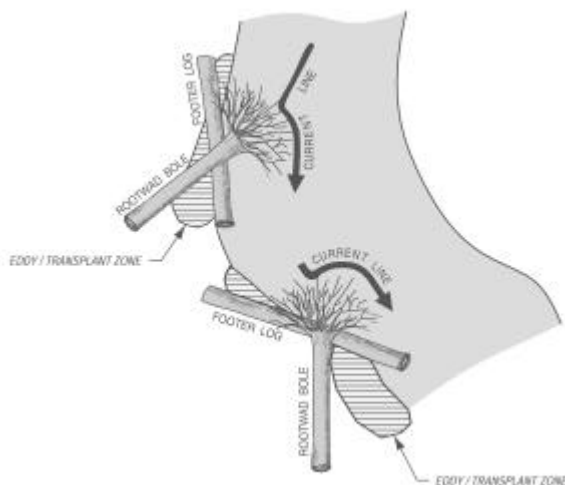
Rootwad Plan View (from Sylte and Fischenich, 2000).
